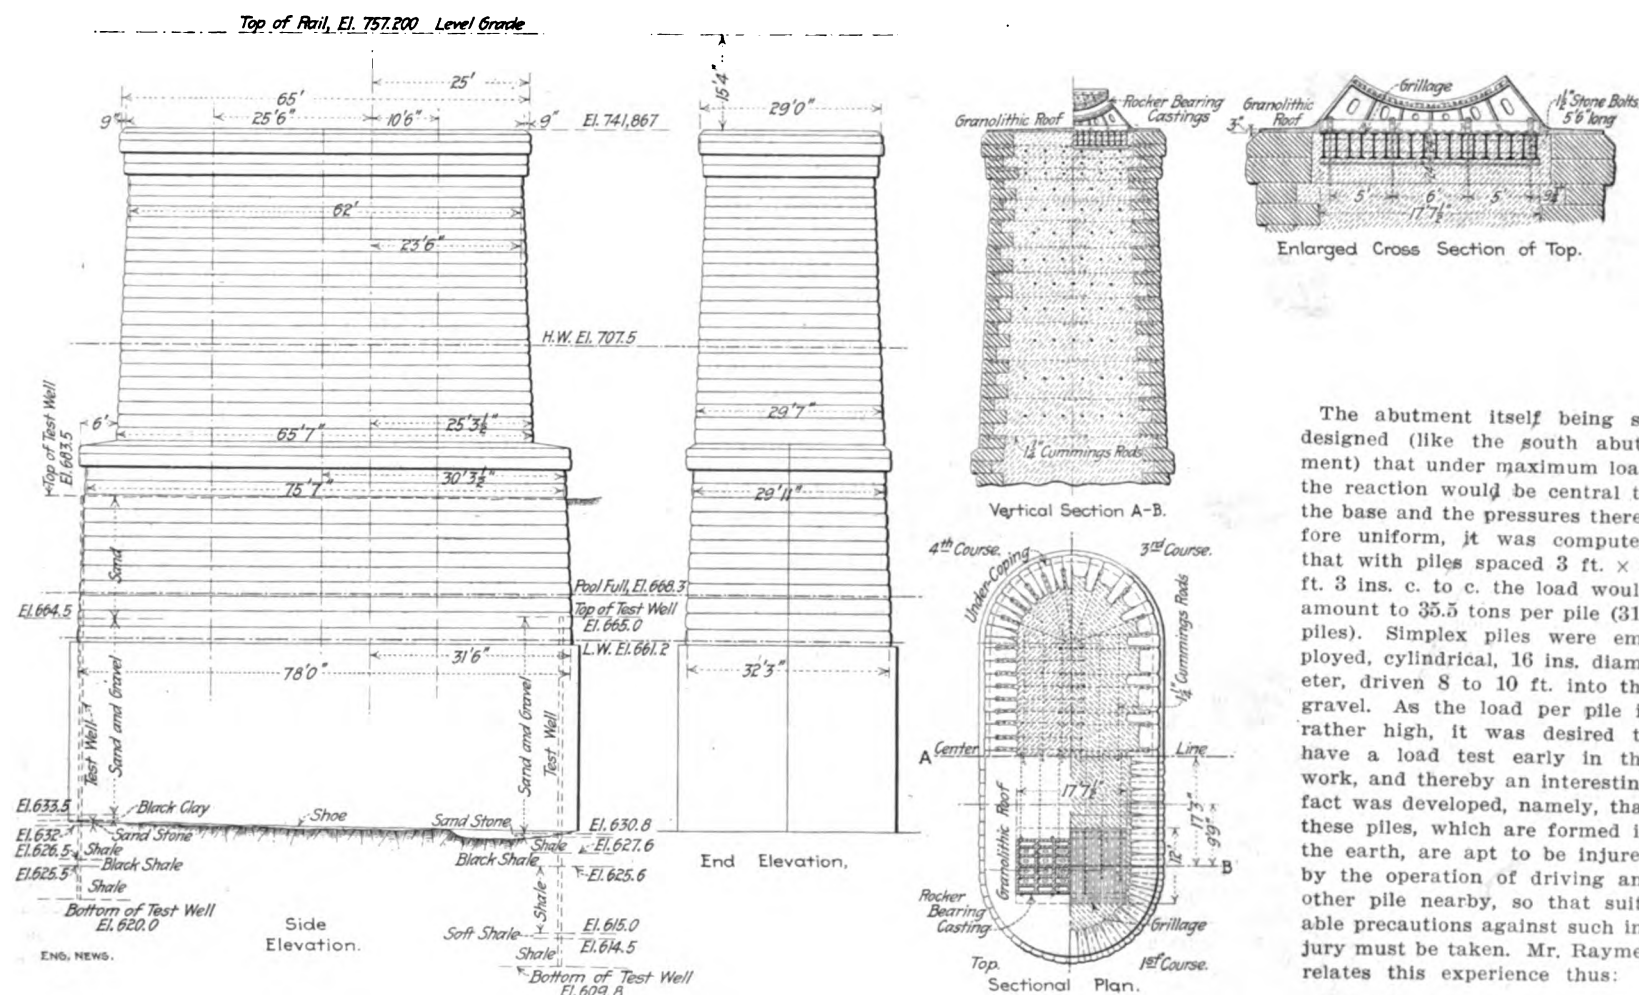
SOUTH CHANNEL PIER OF BEAVER BRIDGE.
